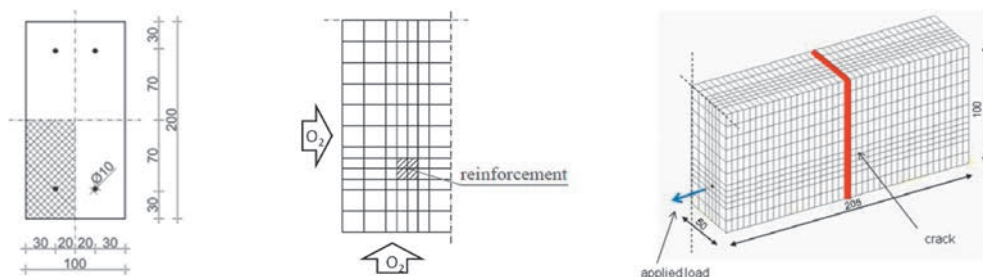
Geometry of analyzed reinforced concrete slab with concrete cover of 30 mm (left) and FE discretization and distribution of cracks with red zones as maximal principal strains in the slab (right)
